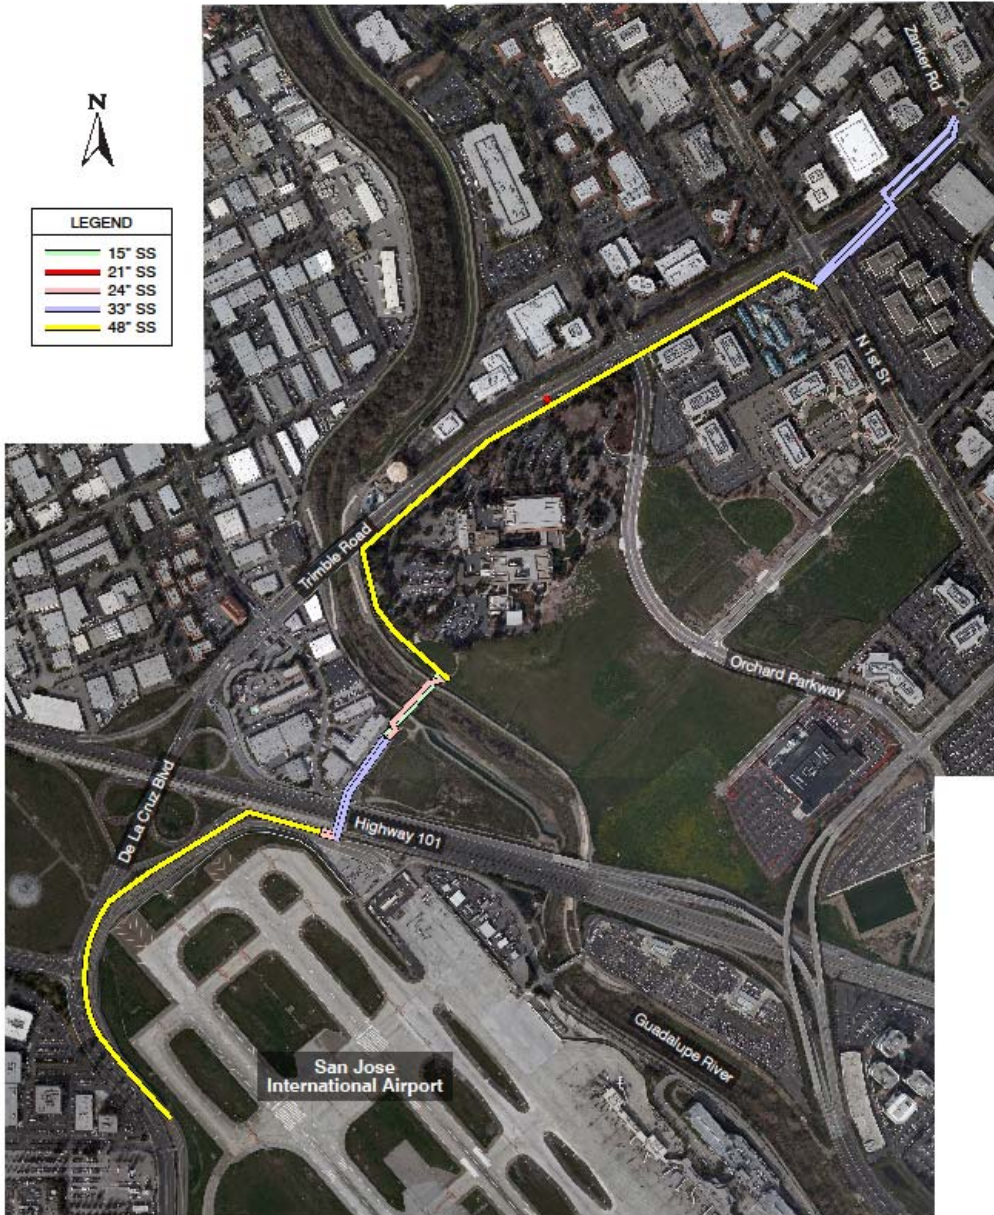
Trimble Road Trunk Sanitary Sewer Layout
